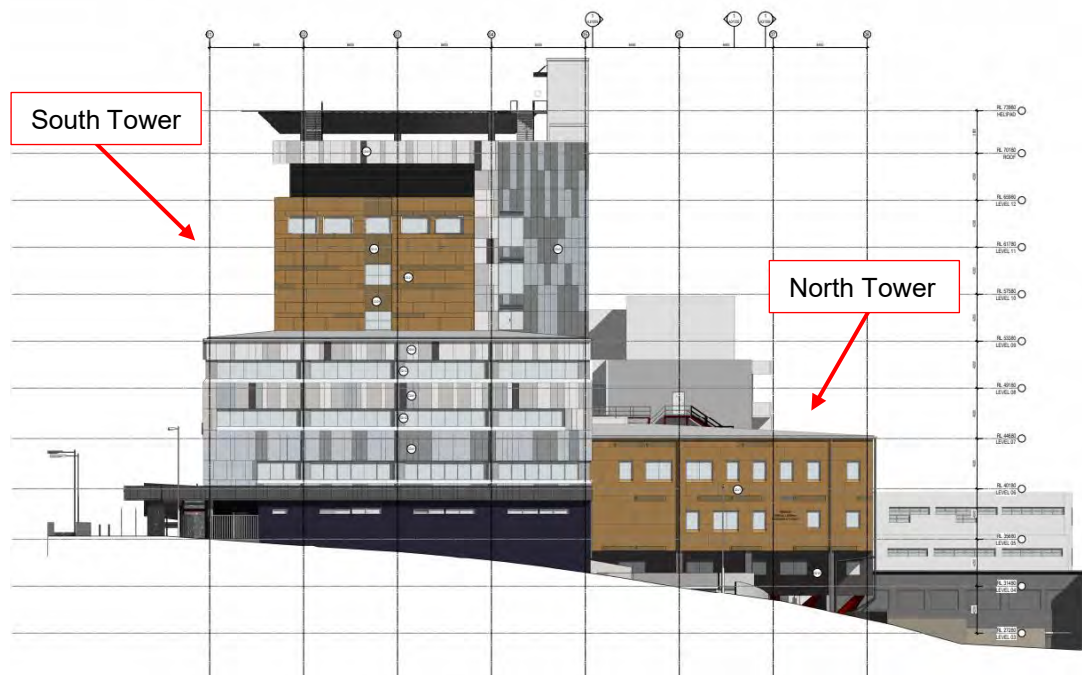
Eastern elevation of the northern and southern towers approved under Stage 3B works (SSD 6848 MOD 3). (Source: Woods Bagot, East Elevation - 3B2, drawing no. A30002, revision J, 1 October 2015)
